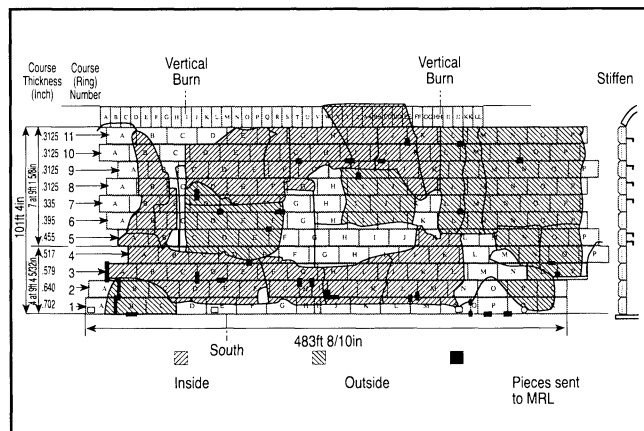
Tank T-80, Wall showing the individual plates from the floor to the knuckle. Cross-hatched sections show pieces removed from wall which were inspected by MRL.
